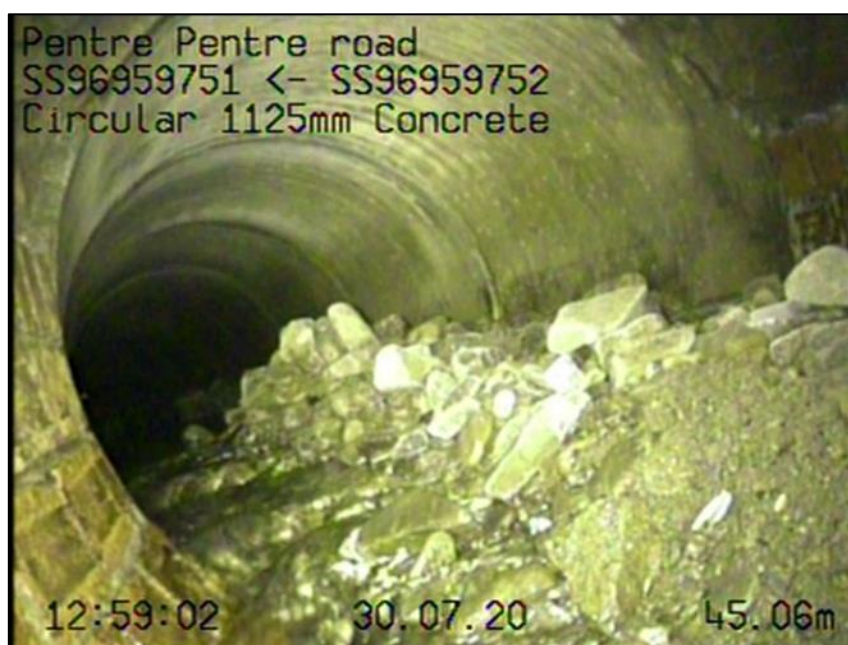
Photo showing full-bore blockage of the Pentre Road network downstream of Pleasant Street Park manhole
